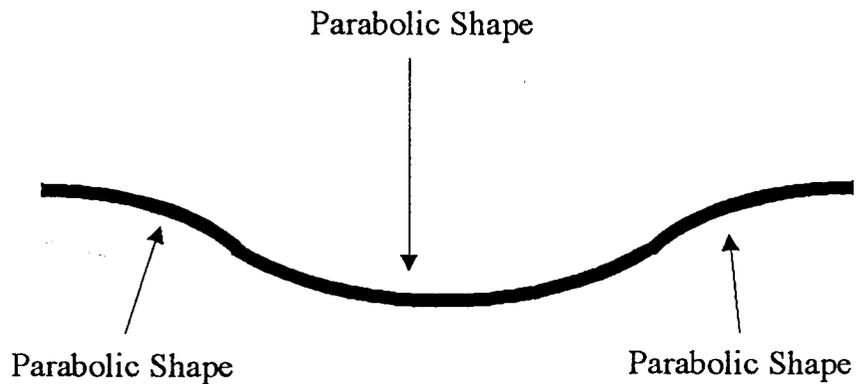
Open Drain Profile and Area 6 Cross-Sections
